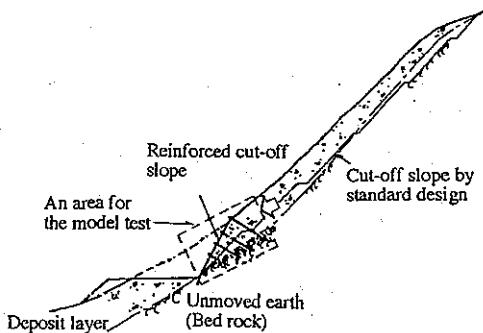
Illustration of a reinforced cut-off slope with steel bars in case of thin deposit layer
